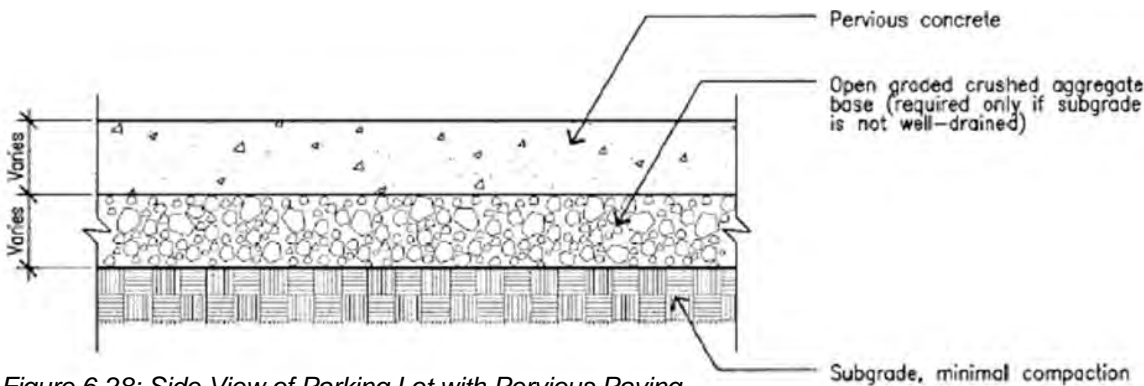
Side View of Parking Lot with Pervious Paving (Source, BASMAA, Start at the Source, 1999)
